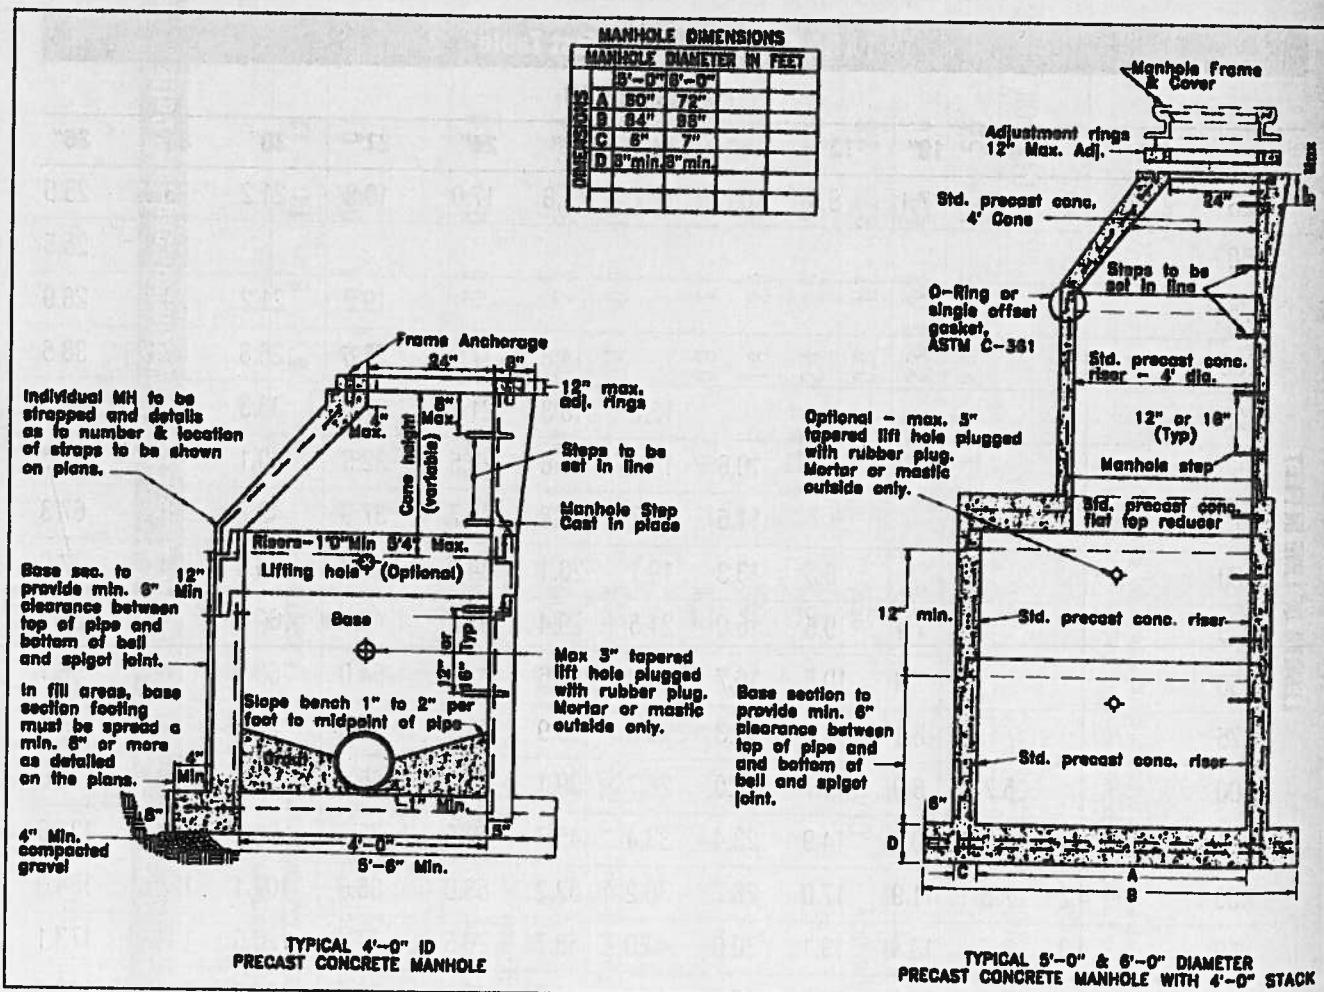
Typical precast manhole design. (*Handbook of Steel Drainage and Highway Construction Products*, reprinted with permission from McGraw-Hill)
